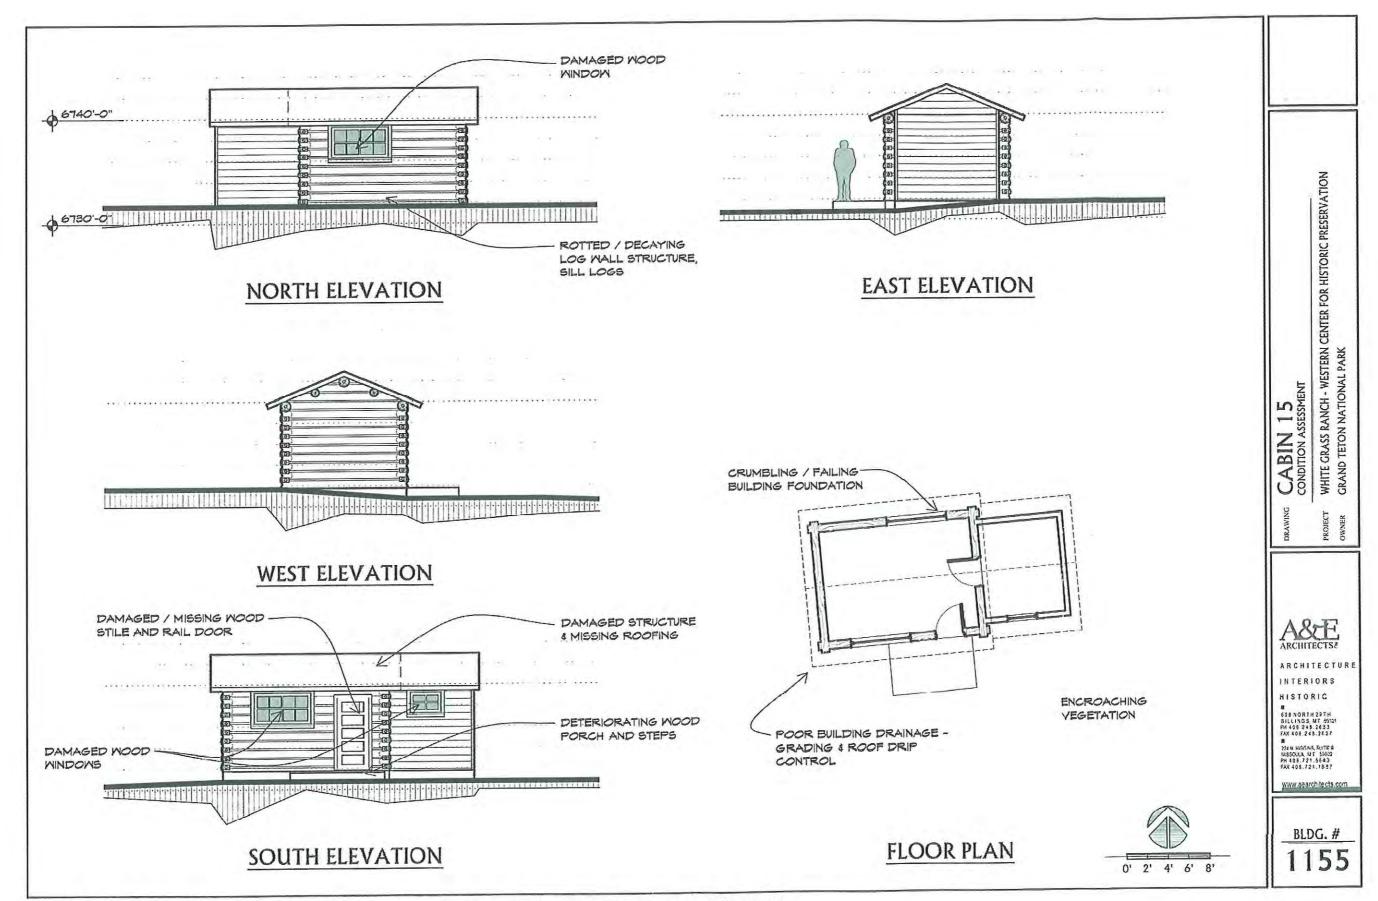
Existing conditions plan and elevations of HS-1155, Cabin 15, showing areas of deterioration (A&E: 2006).
